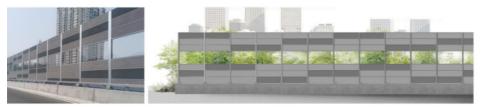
South Extension Noise barrier of Wanshou Road, South Fourth Ring Road, Beijing.
